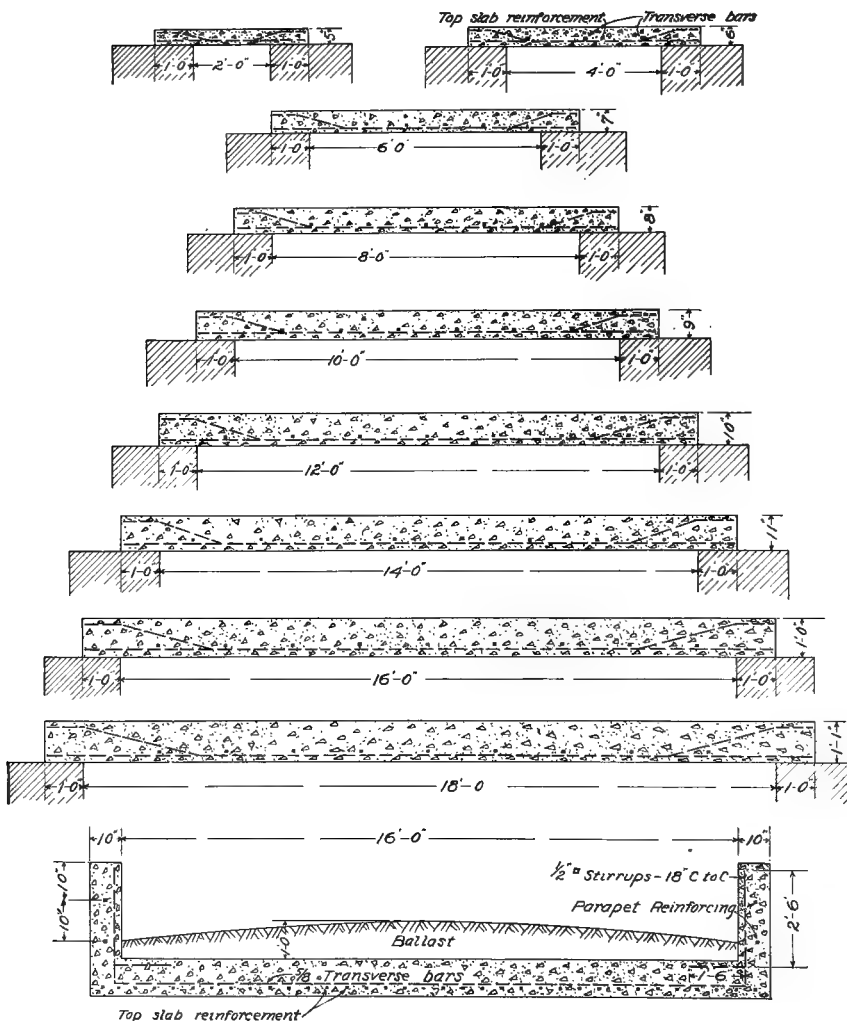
Typical Reinforced Concrete Slabs for Highway Culverts, Office of State Highway Commission, Richmond, Va.
